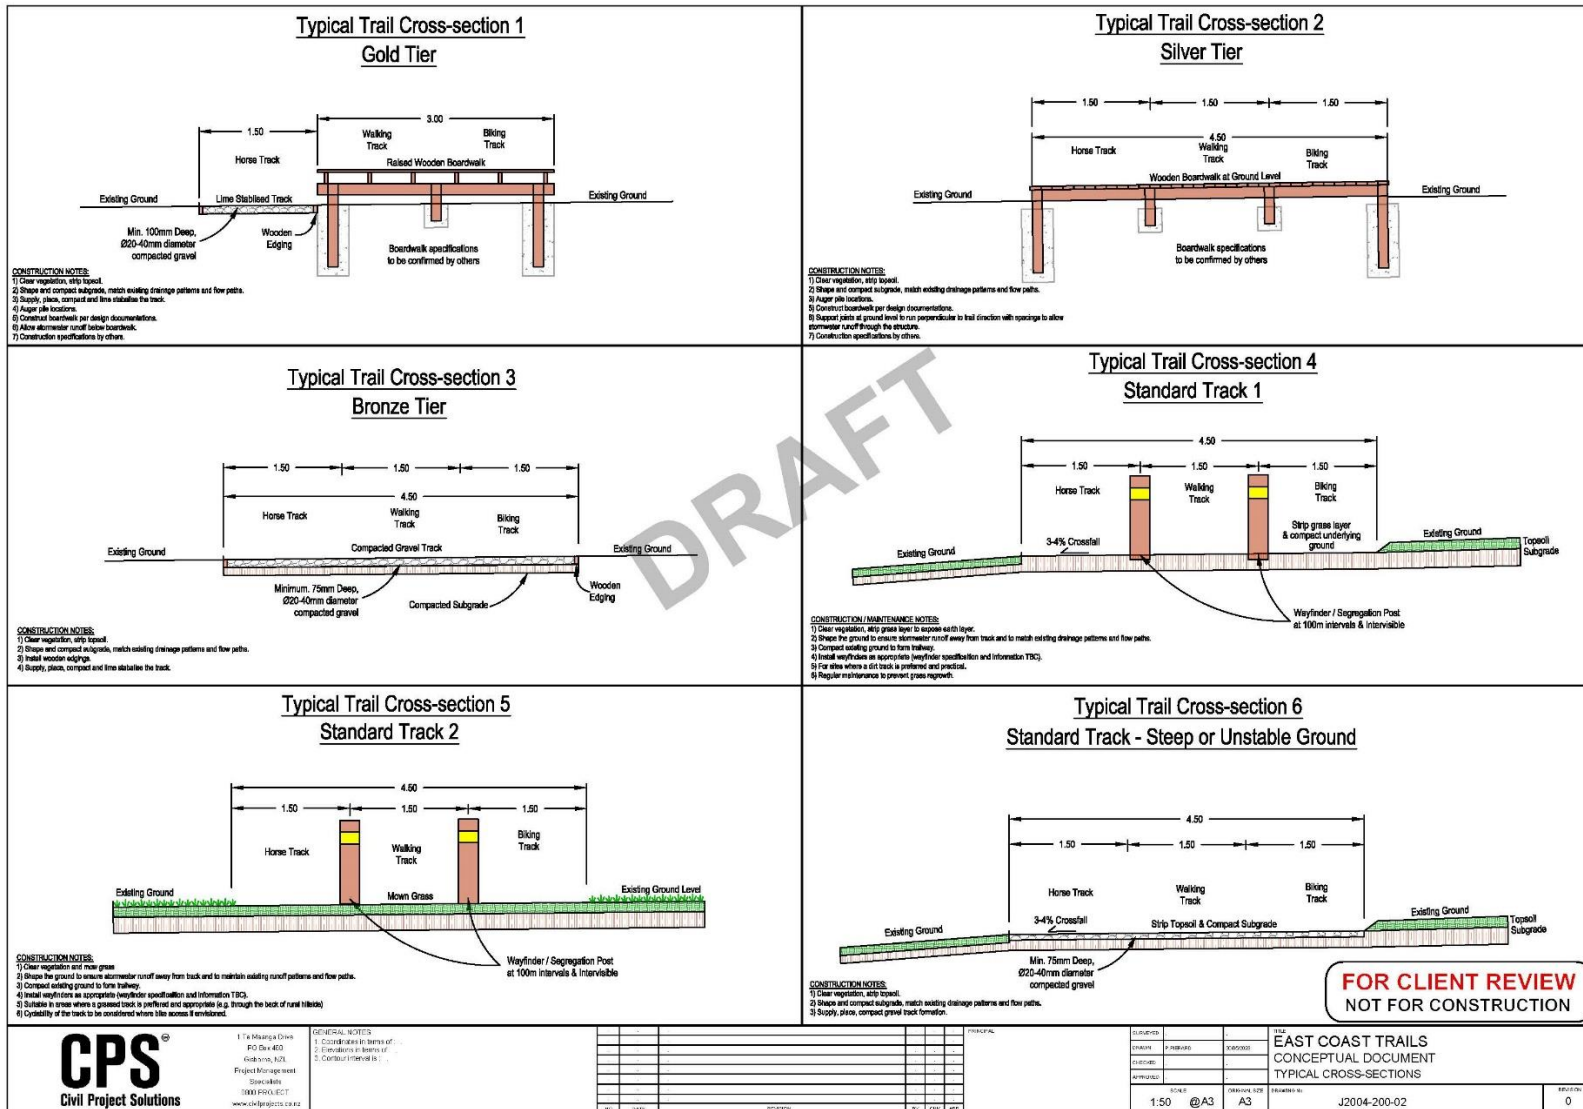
Concept drawings of the proposed trail tier constructions (Source: Civil Project Solutions).
